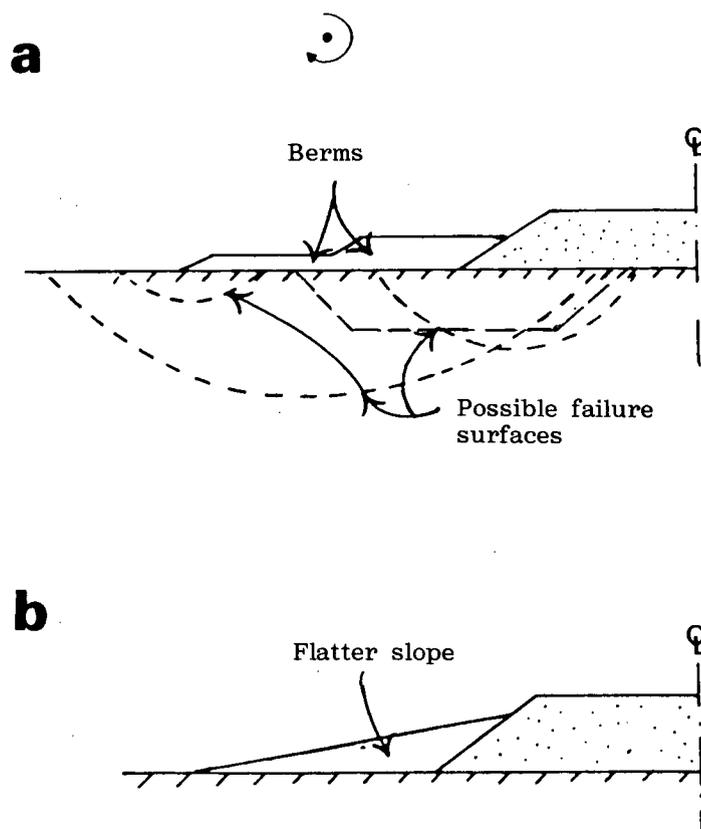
Stabilization of an embankment with (a) berms or (b) flatter slopes (after 31).
